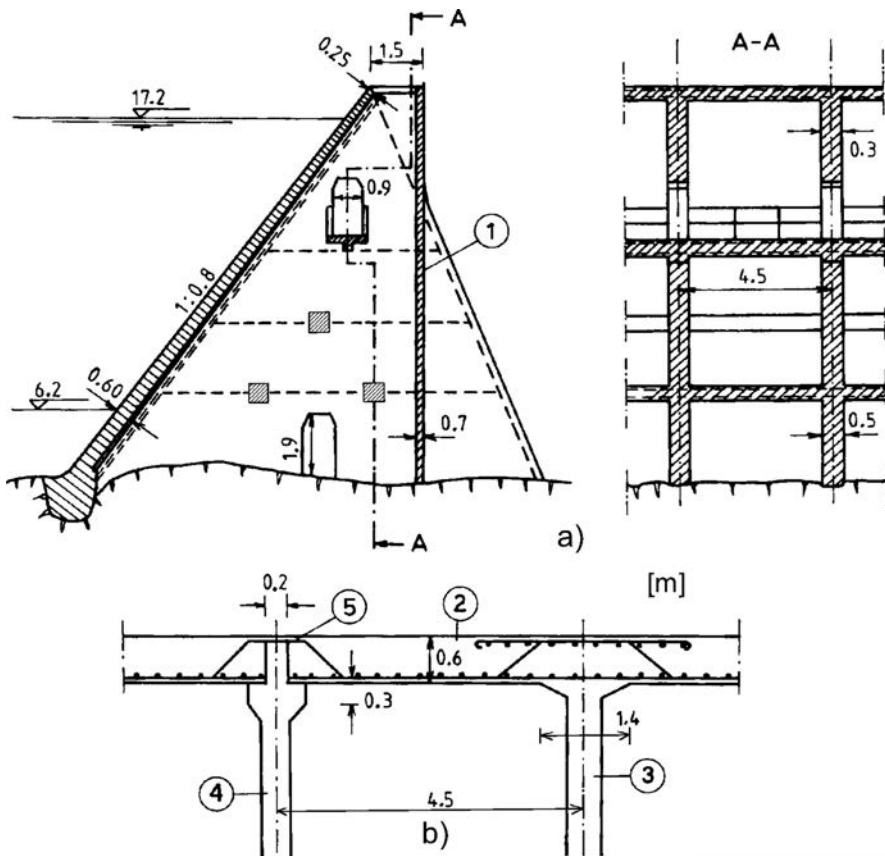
Fergental buttress flat-slab dam. (a) Cross-section and section A-A; (b) section of the cover slabs at a depth of 10 m. (1) Reinforced concrete wall aimed at reducing the cooling down of the space downstream of the upstream slabs; (2) external side of the slabs, coated with cement grout; (3) buttress, rigidly jointed with the slab; (4) every third buttress, separated from the slabs; (5) asphalt insulation.
